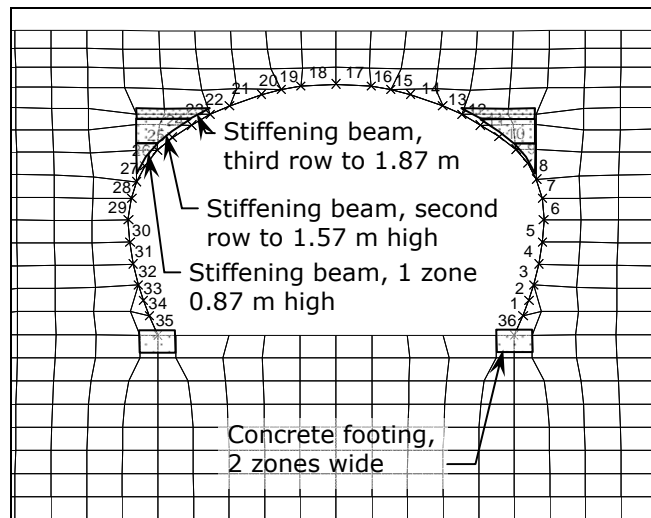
Structural liner element numbers used in the FLAC modelling.
